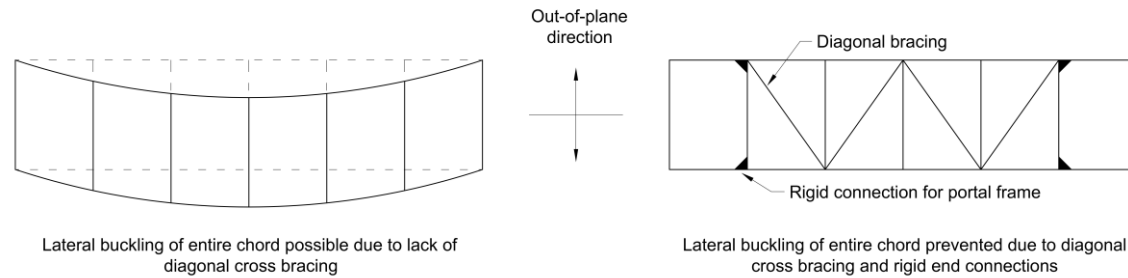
View of a truss bridge from above, showing how cross bracing can restrain the chords from buckling over the entire span.
